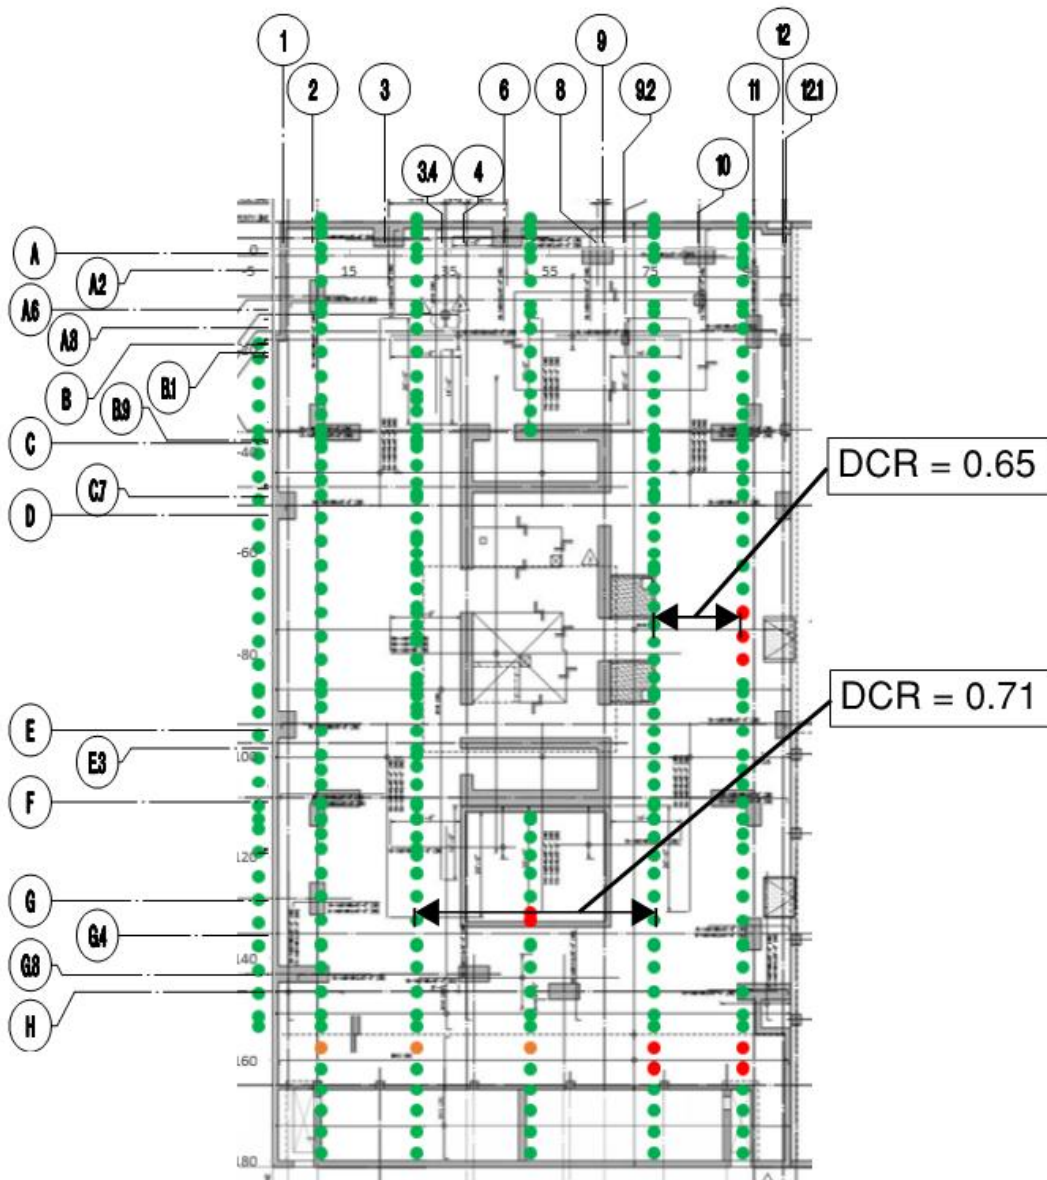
DCR Plot for North-South Top Reinforcement Design Strips for Gravity Load Envelope with Jacking Loads
